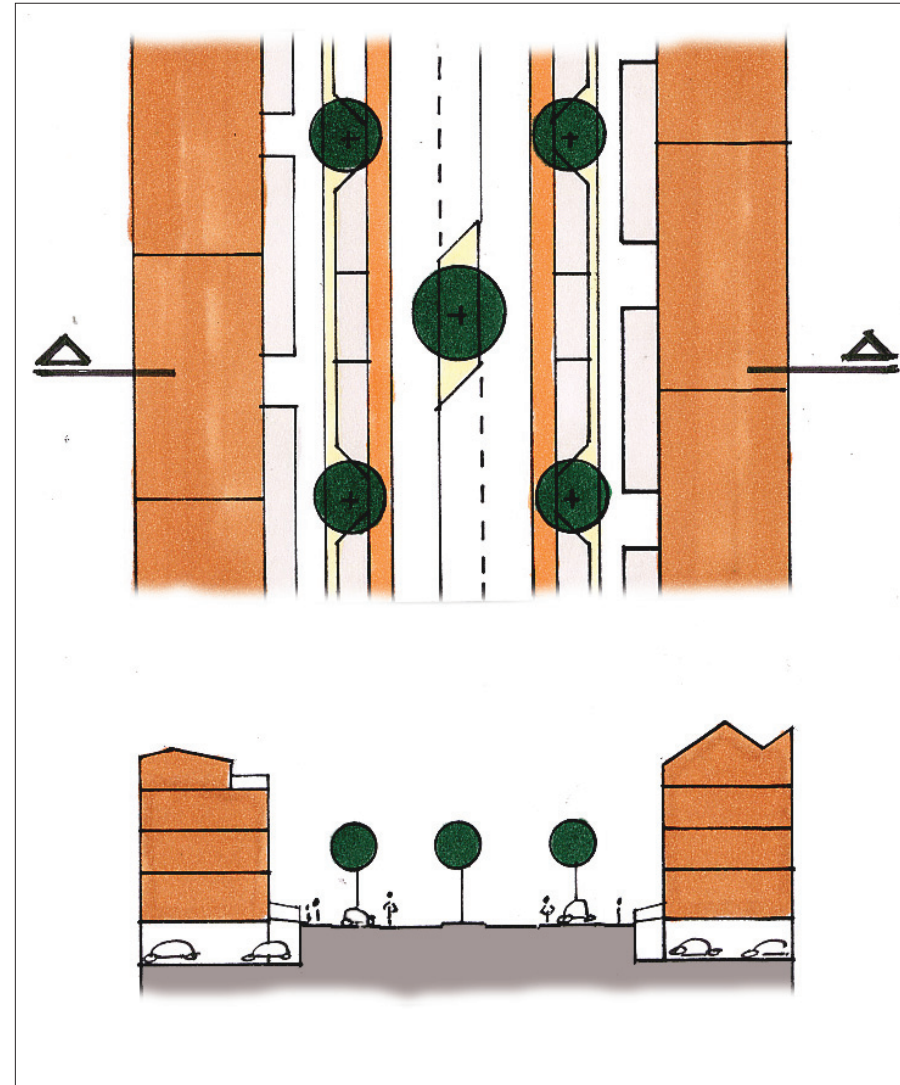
Typical arrangement of Stoneview Upper and Lower Collector Roads at the Neighbourhood Centre
